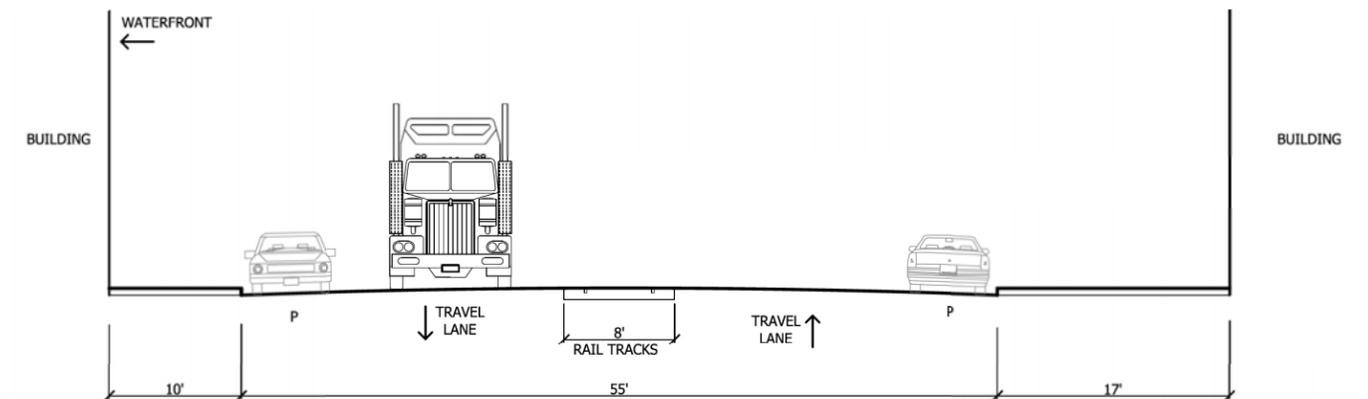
Existing configuration on First Avenue between 51st and 58th Streets
